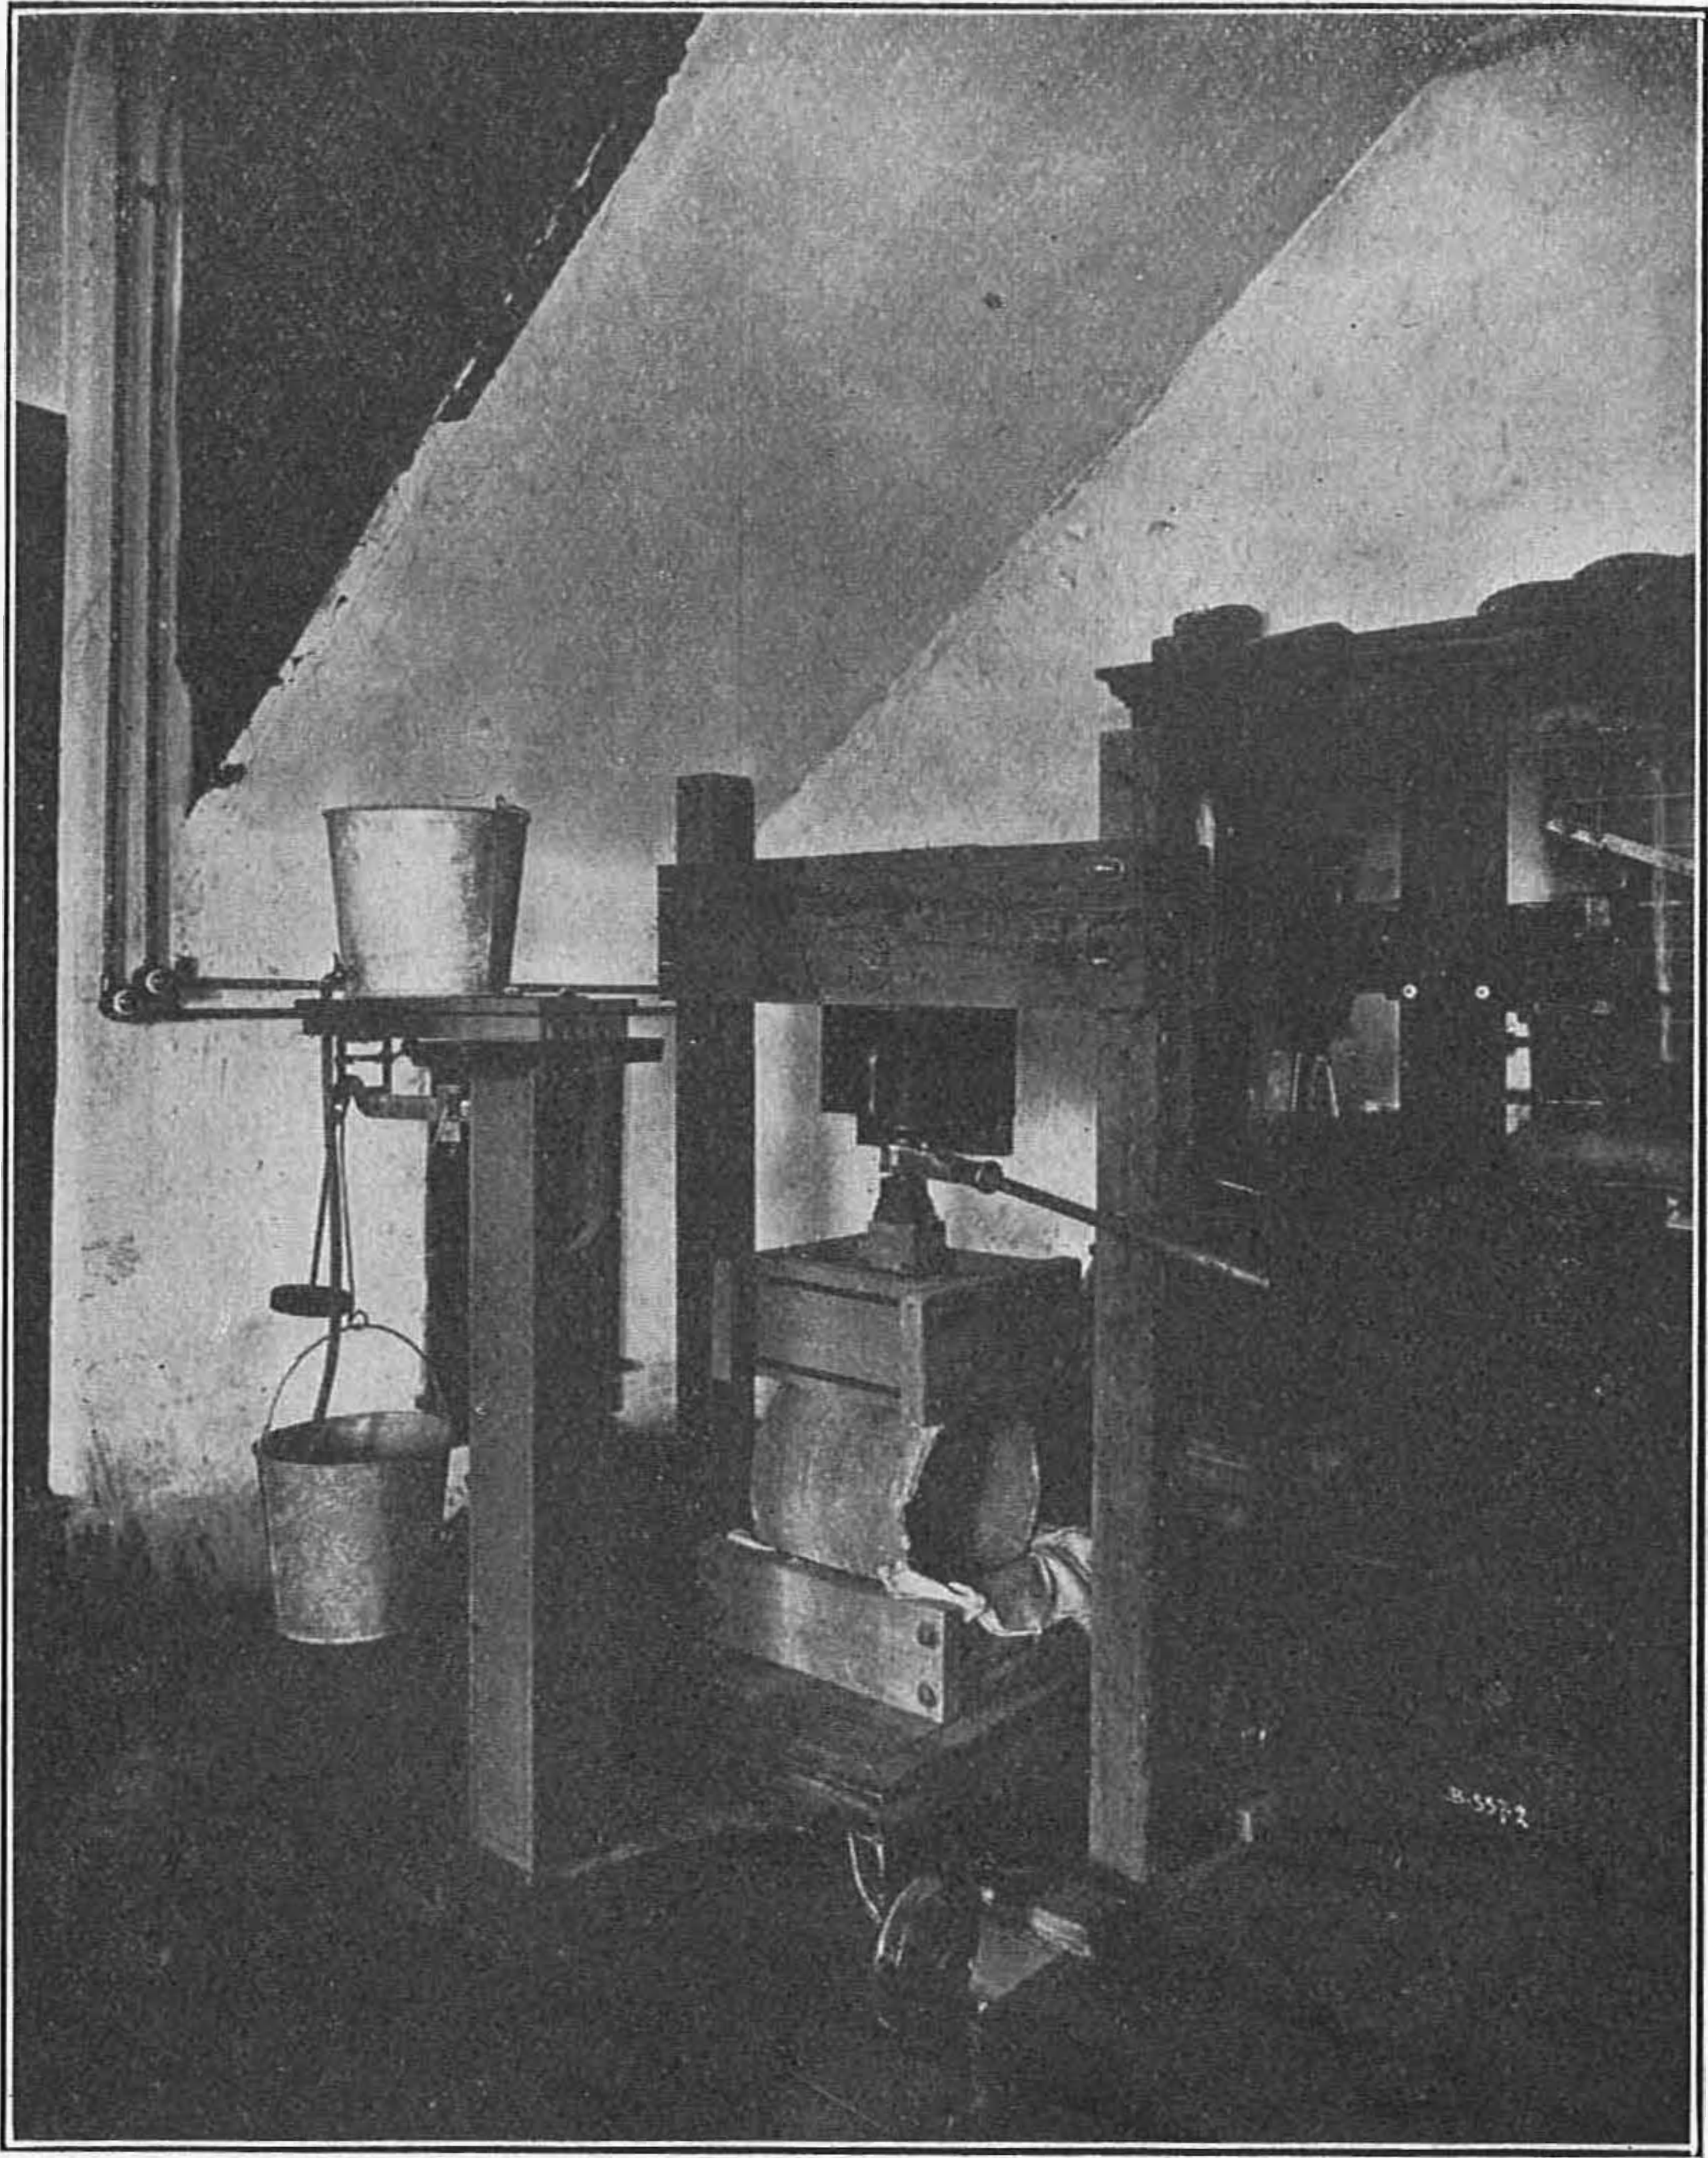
Testing a Twelve Inch Drain Tile with the Ames Junior Testing Machine.
